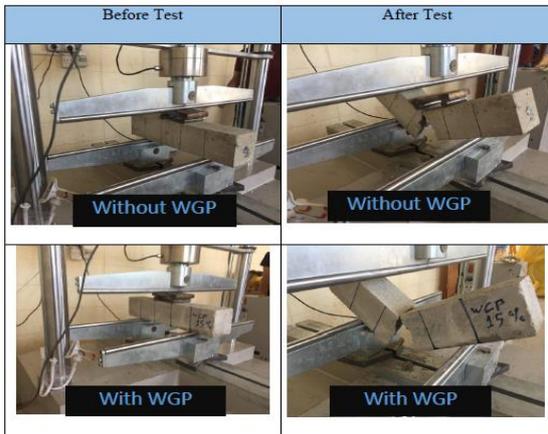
Shape of the specimens under compressive loads before and after failure.
